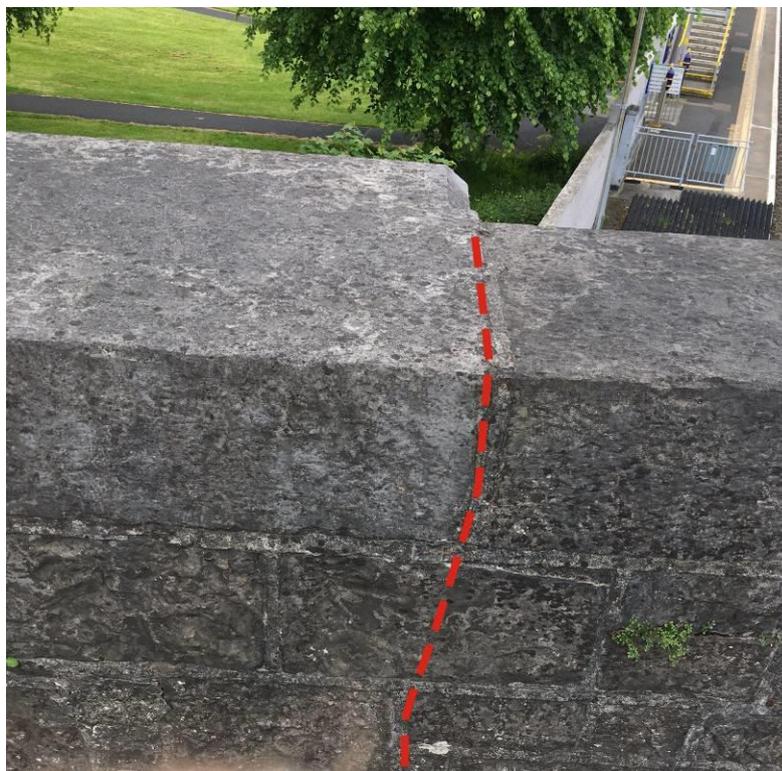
Image of parapet internally with line highlighting where the junction with the new concrete parapet will be.
